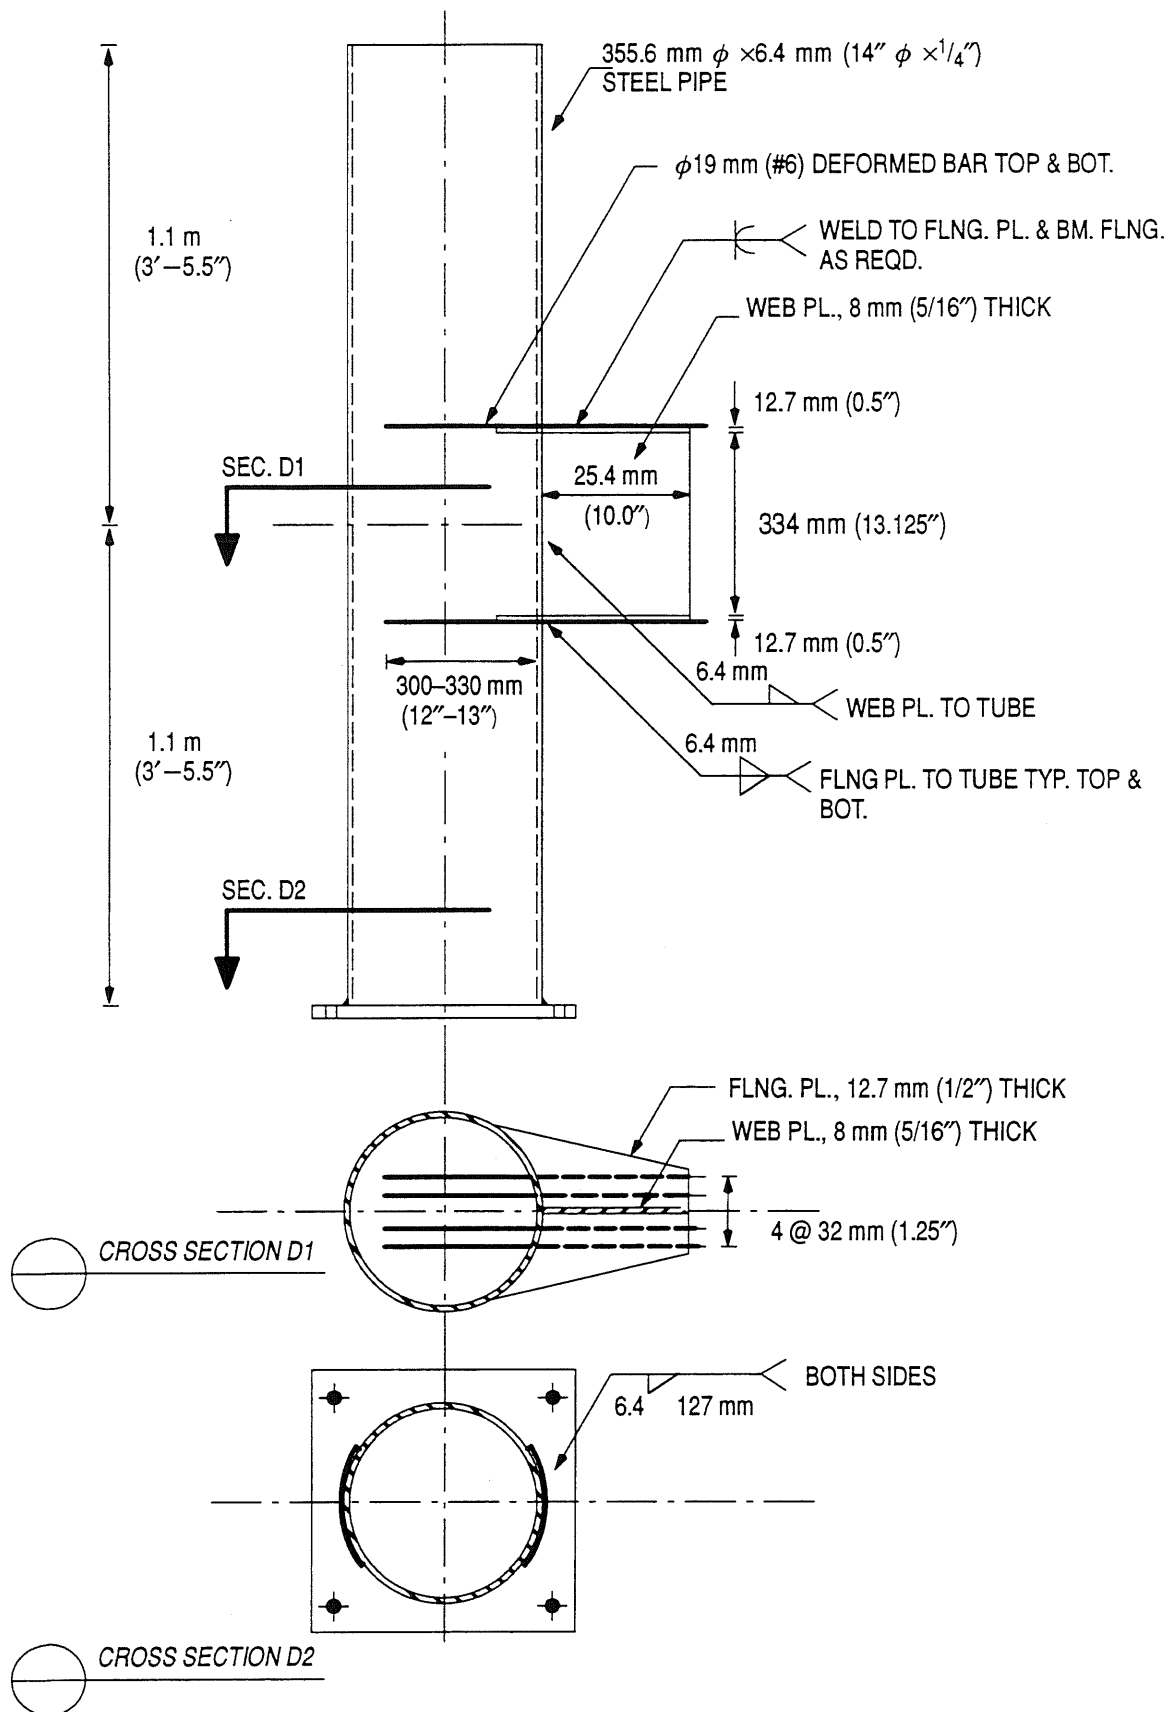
Connection w/ Deformed Bars Embedded in the Concrete, *Type III
